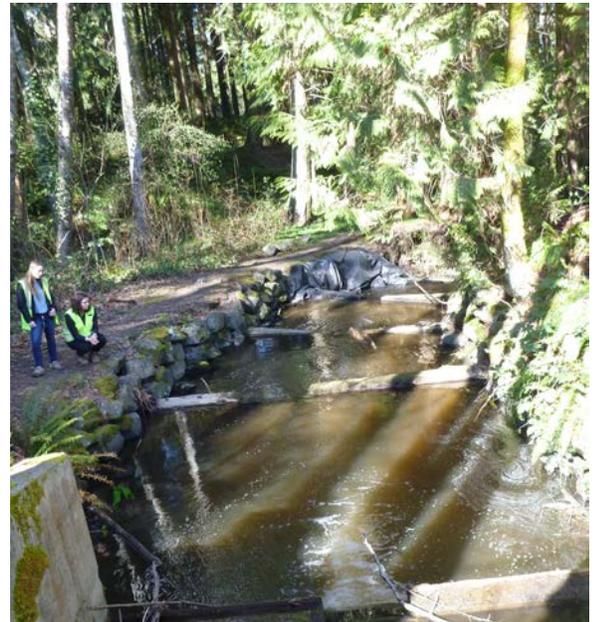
Looking north from Fletcher Bay Road to series of weirs below the culvert. Illustrates armor on the bank, channelization of the stream, and weir system.
